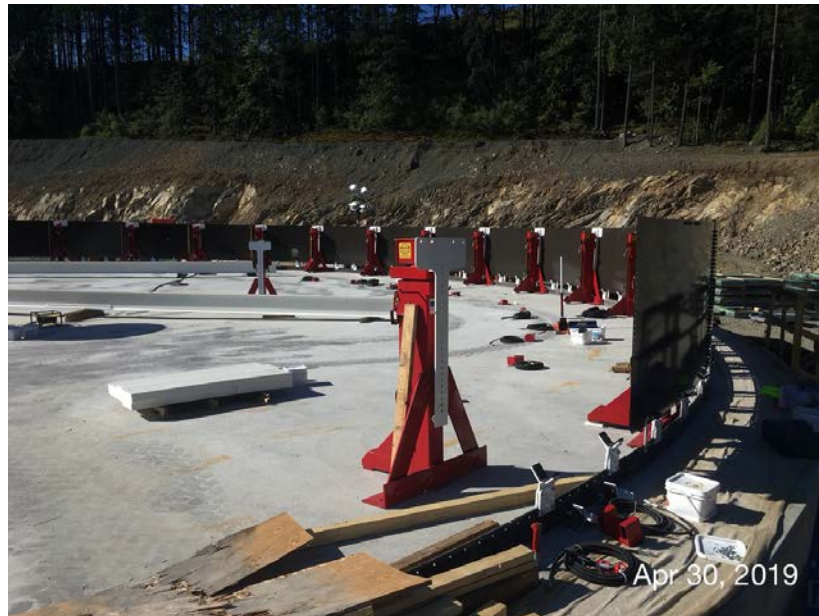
Residuals Treatment Facility: assembly of first ring of bolted steel tank in Digester #1.
